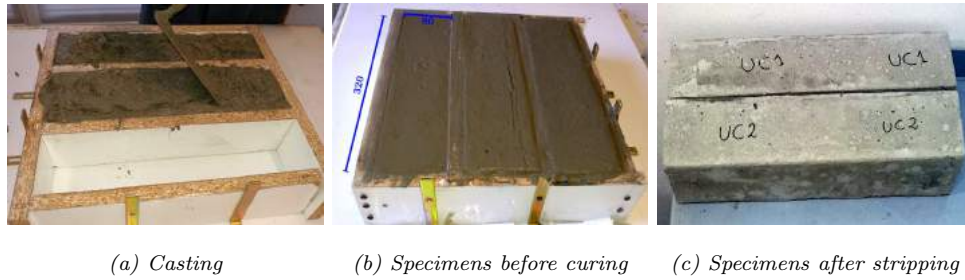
Medium-scale prismatic specimens manufacturing.
